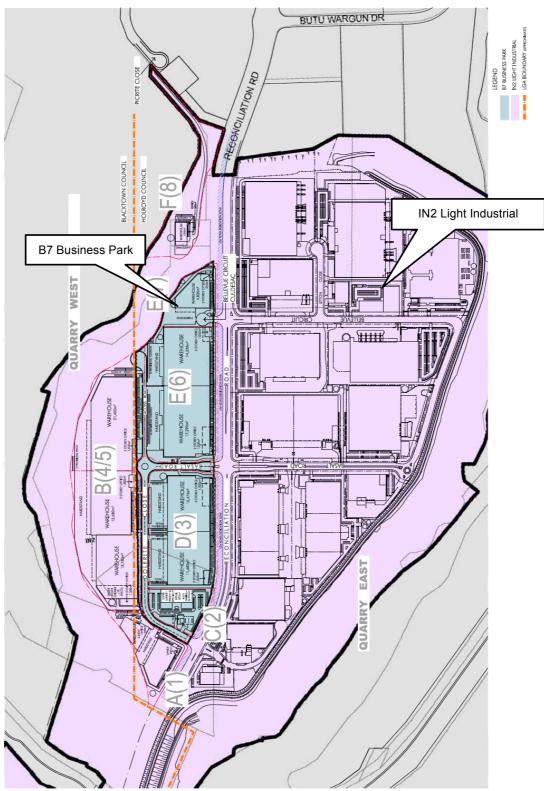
Zoning Plan (showing original masterplan layout) (Source: Nettleton Tribe)
